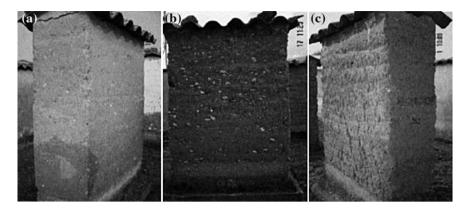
Rammed earth masonry sections exposed during 20 years to natural climatic conditions. a Wall made with soil stabilized with 5% lime, b Wall made with soil without stabilization (mixed soil), c Wall made with soil without stabilization (Bui et al. 2008)
